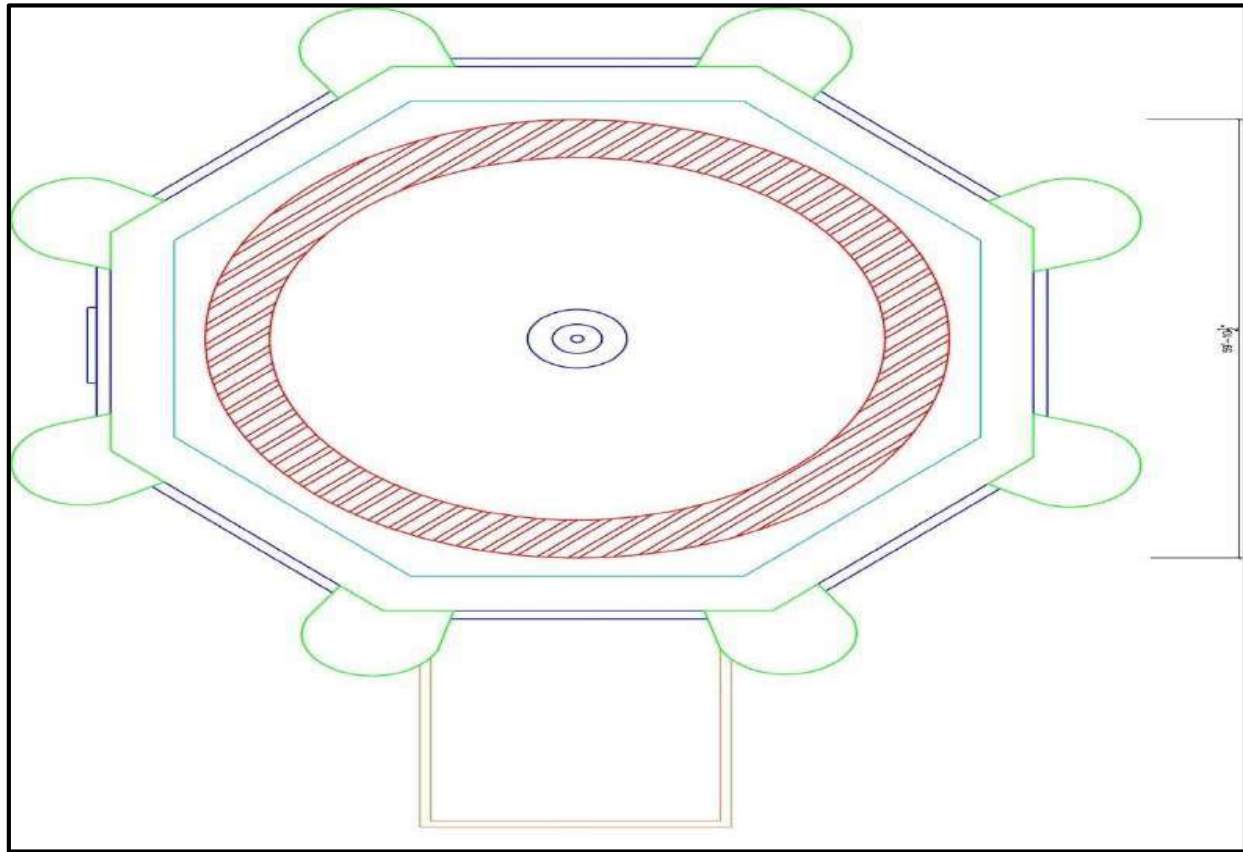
Dome Floor Plan (Source: Archeology Department Multan)
